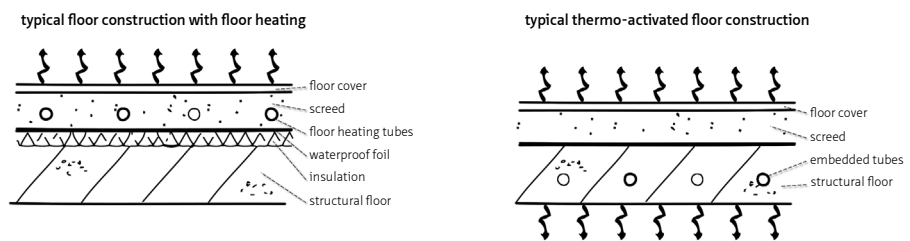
Typical floor construction with floor heating (left) and typical thermo-activated floor element (right). Adapted from Babiak et al. (2007b).
